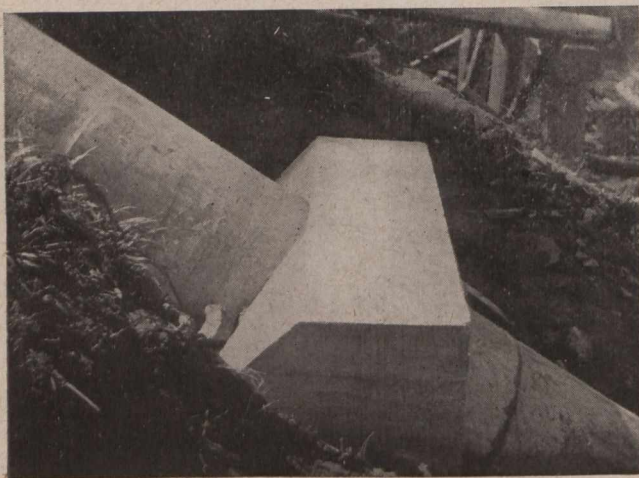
Concrete Anchor in a Syphon Section of the Pipe Line.
